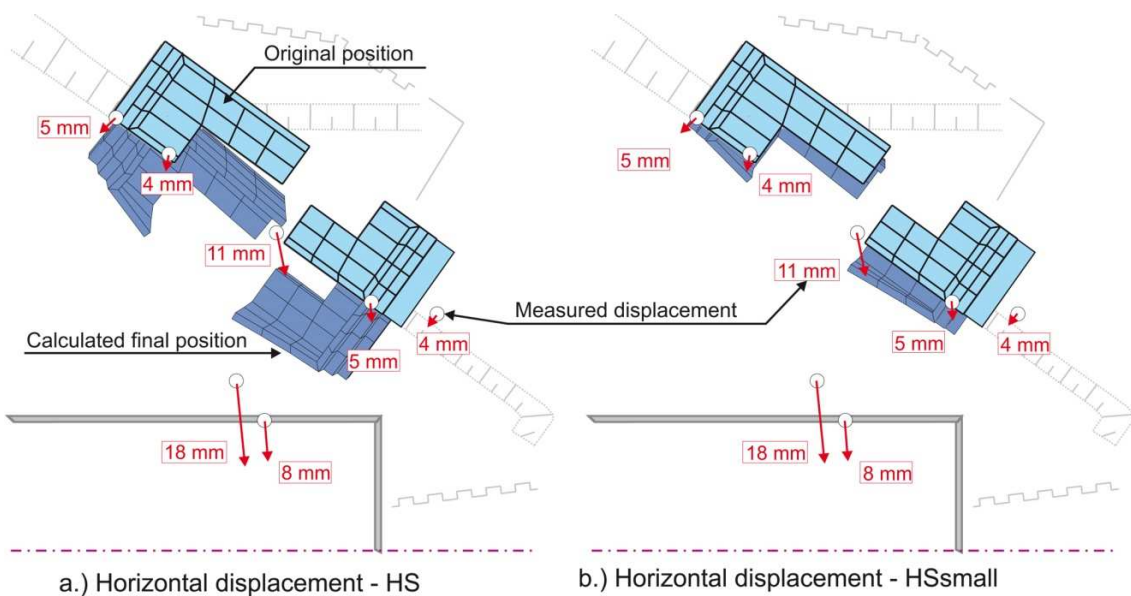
Measured and calculated horizontal deformation of the bridge abutments
